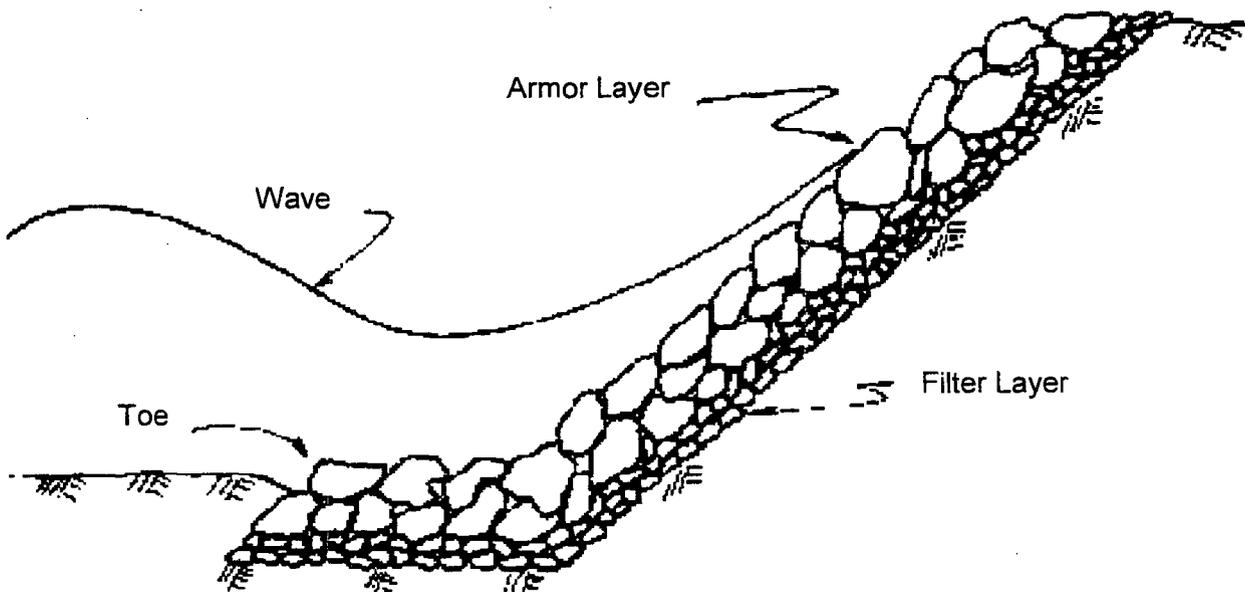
Typical revetment section (from EM 1110-2-1614 "Design of Coastal Revetments, Seawalls, and Bulkheads").
